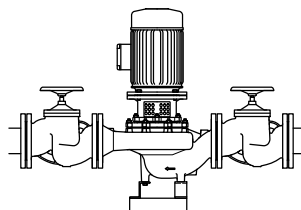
Vertical installation / mounted on three angle feet (steel 37, accessory), sizes 032-032-160 to 100-100-125
